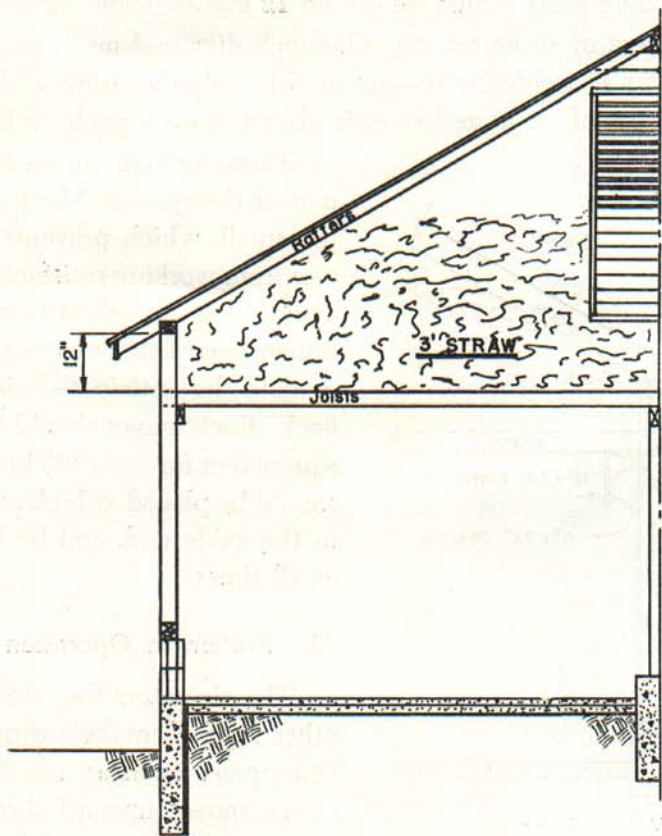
Straw loft laying house (detail). Joists are dropped 1 foot, and a louver placed in the loft door. Loft should be filled with straw to the depth of 3 feet.
